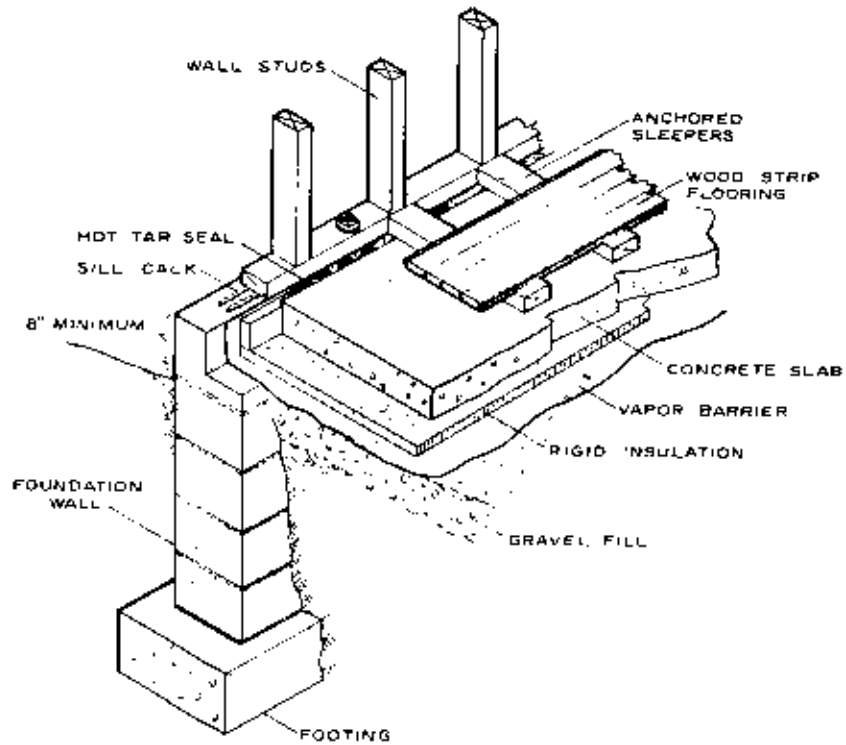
Slab on grade with foundation wall. (U.S. Department of Agriculture)
